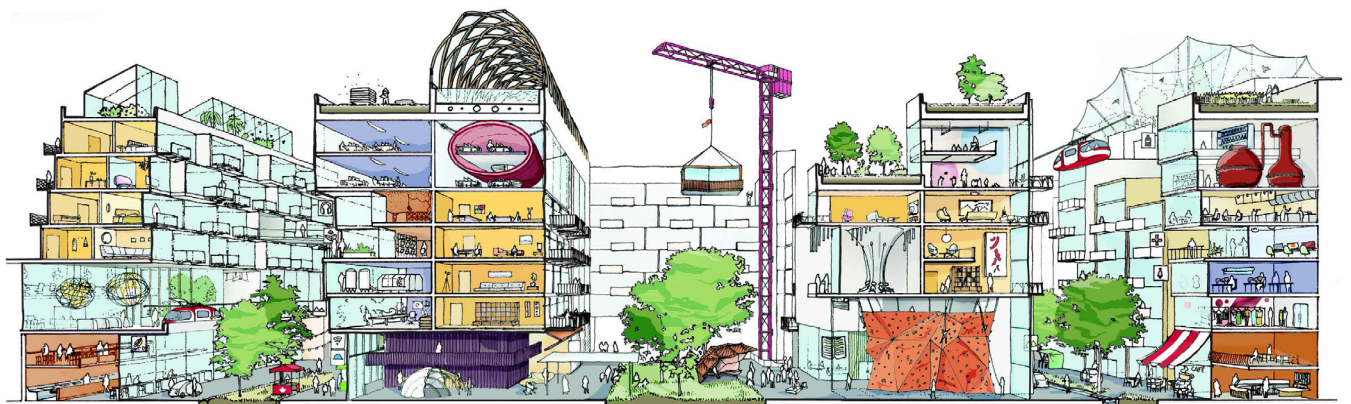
Sidewalk Toronto's proposed "Loft" building typology.
